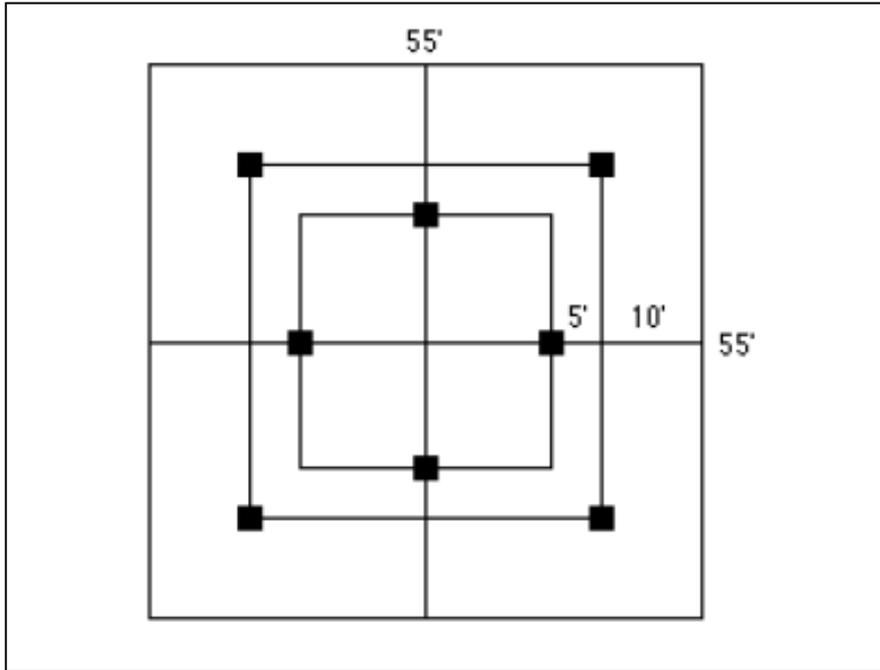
Every Other Row Option Parking Lot with Fully Shielded Luminaires (*Monrad Engineering, Inc.*)
